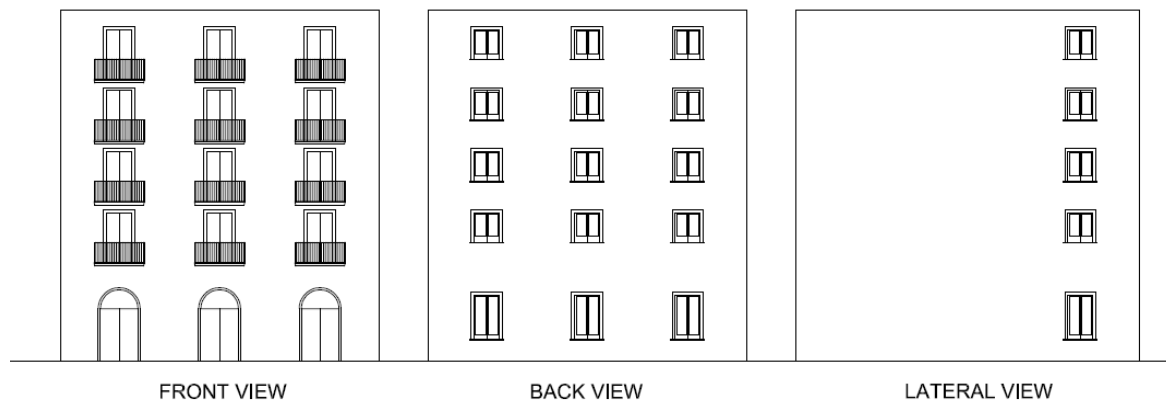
Elevations of the considered building, obtained from a simplification of the real building.
